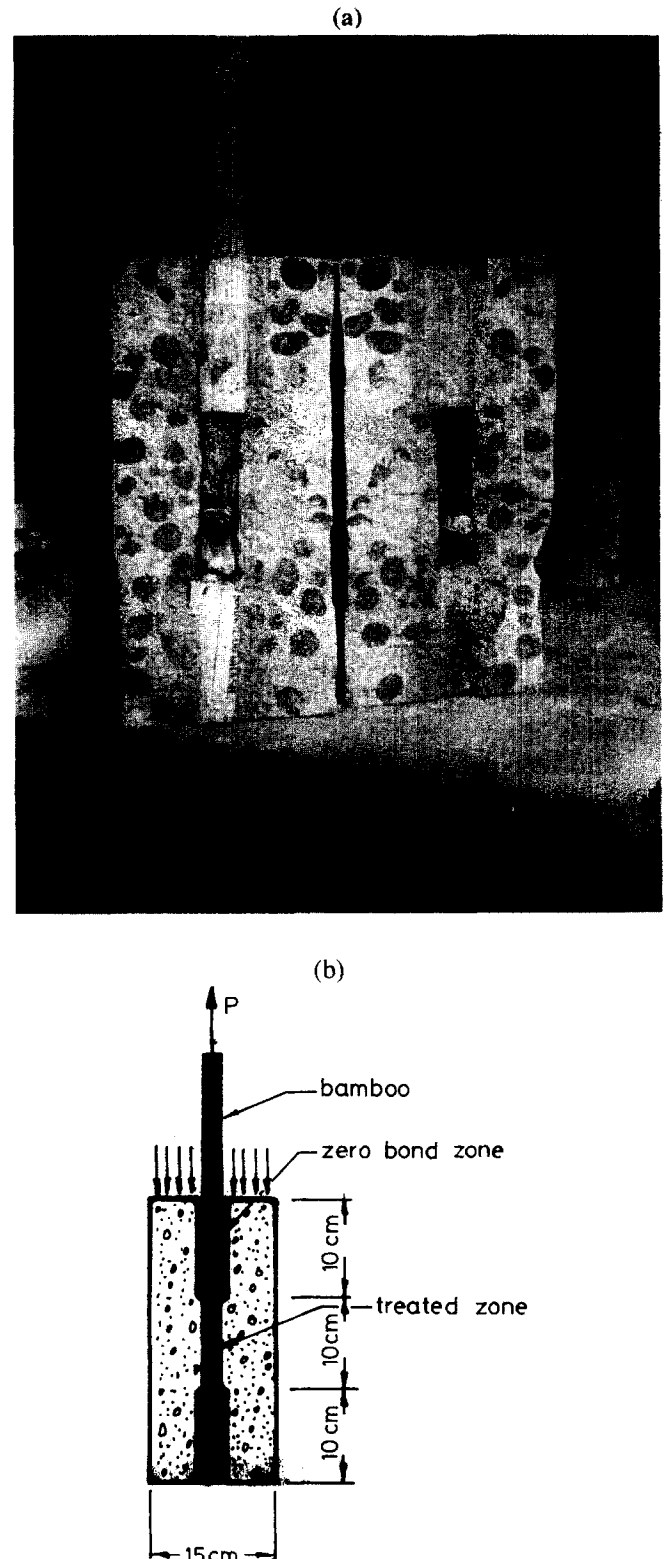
Bamboo reinforced concrete pull-out test. (a) Position of bamboo in side concrete cylinder. (b) Dimensions of pull-out test.
